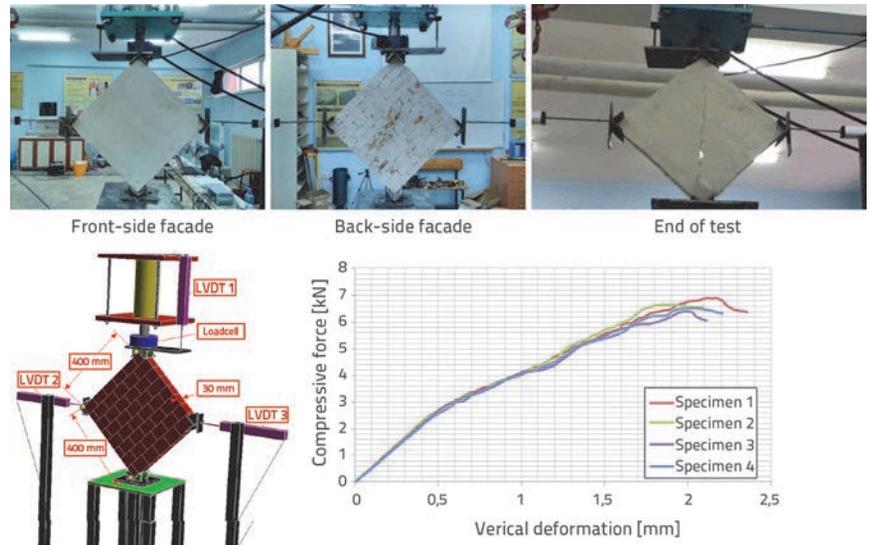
Compressive force - vertical displacement graph of brick wall and test setup of brick wall
